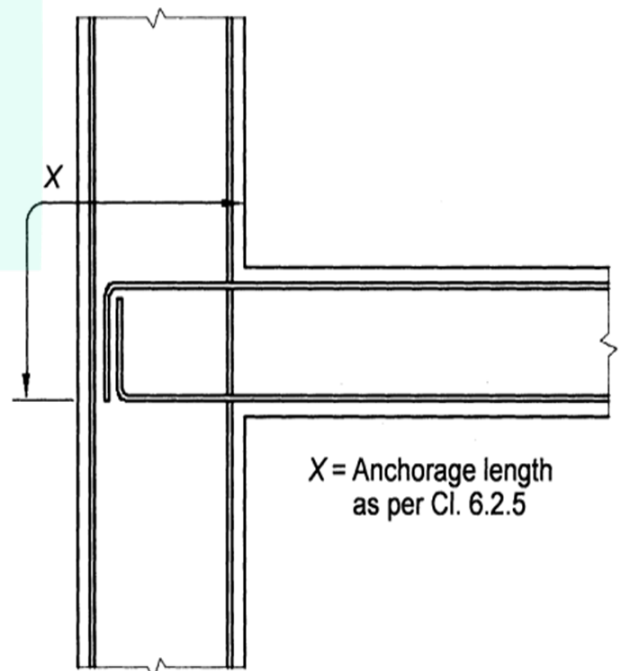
ANCHORAGE OF LONGITUDINAL BEAM BARS AT EXTERIOR BEAM-COLUMN JOINT
